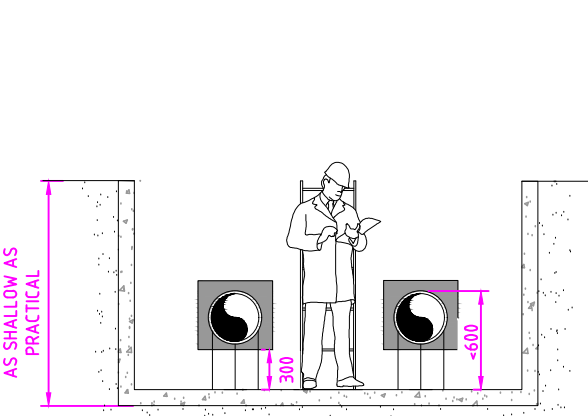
A: THREE LADDER ACCESS (≥DN375 MAINS). FLOOR LEVEL LAYOUT
